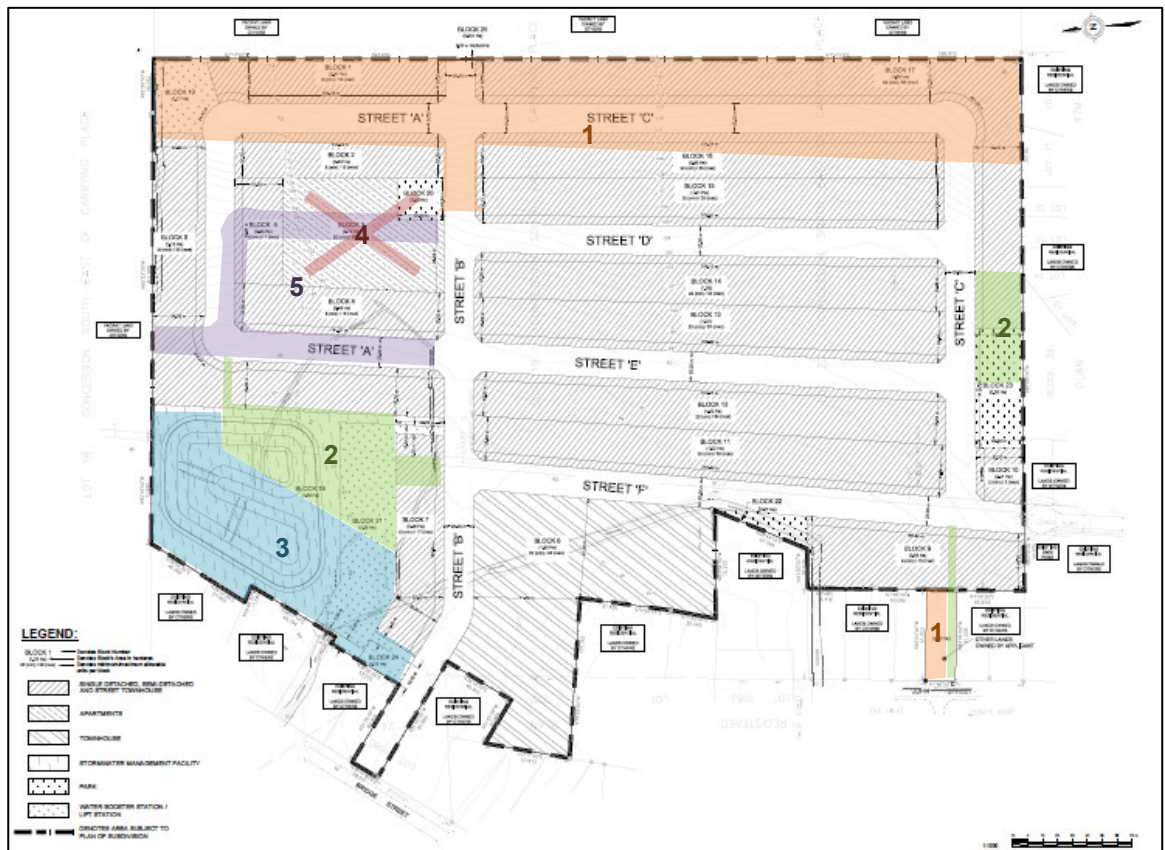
Highlighted updates to the Draft Plan of Subdivision overlaid on the August 2019 Draft Plan (source: Arcadis IBI Group)
